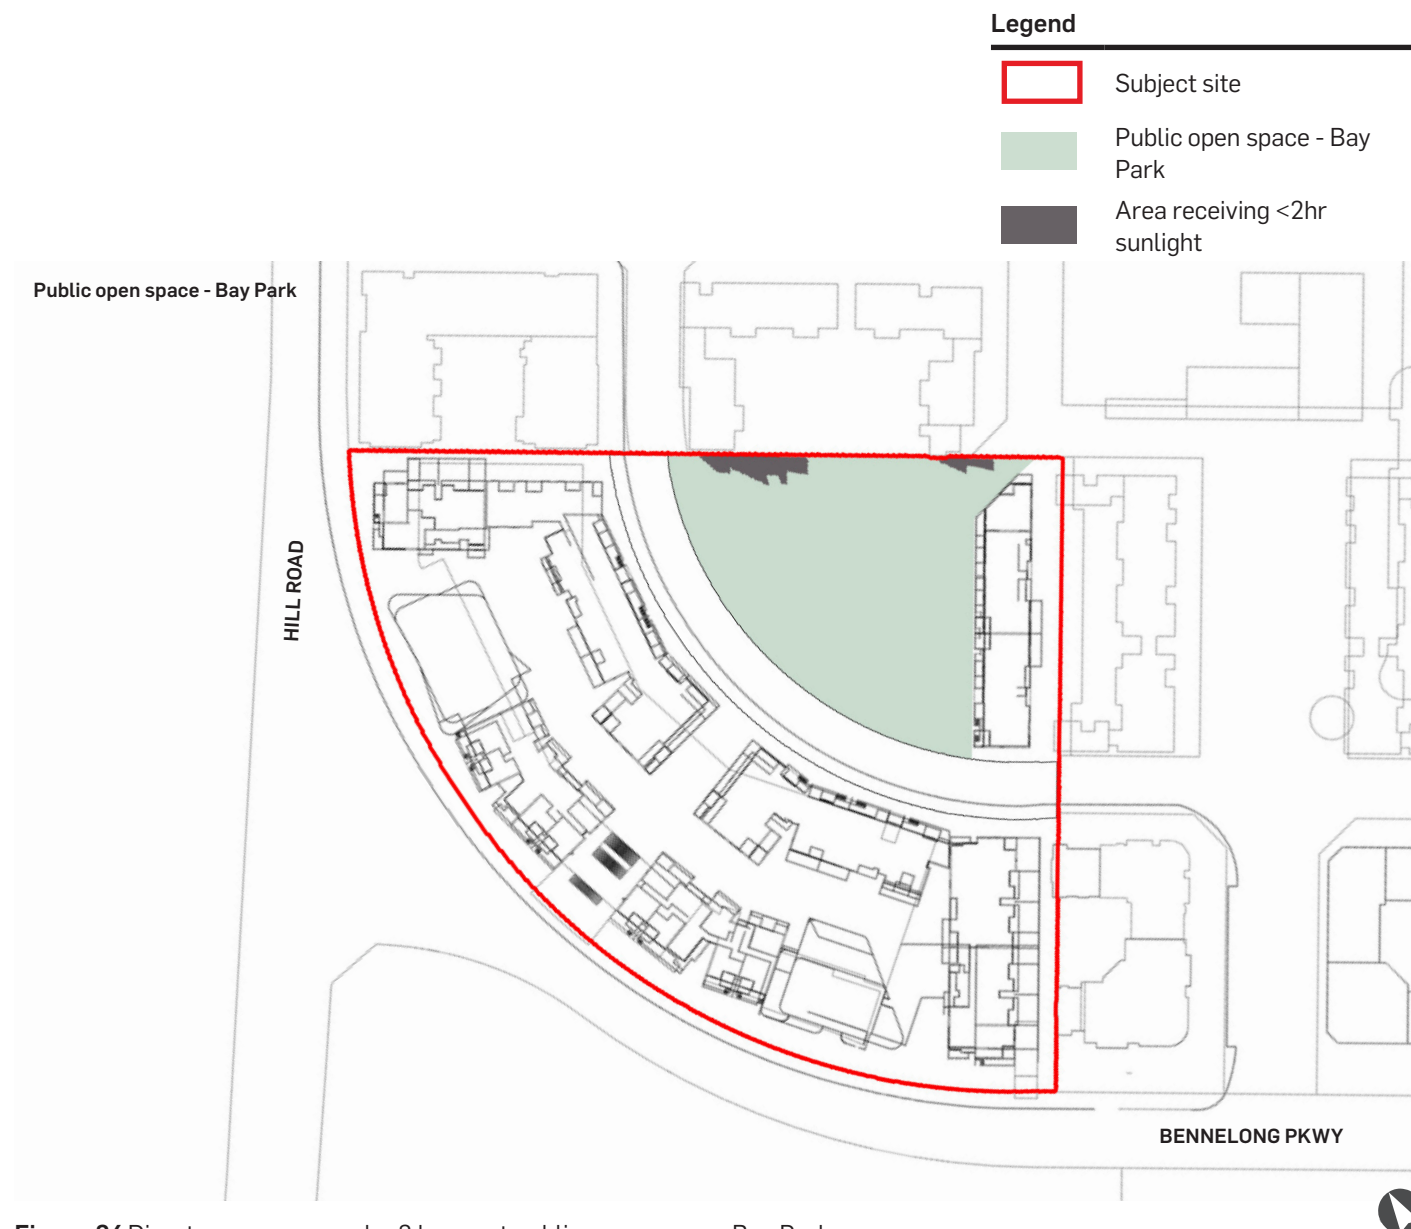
Direct sun access under 2 hours at public open space - Bay Park
